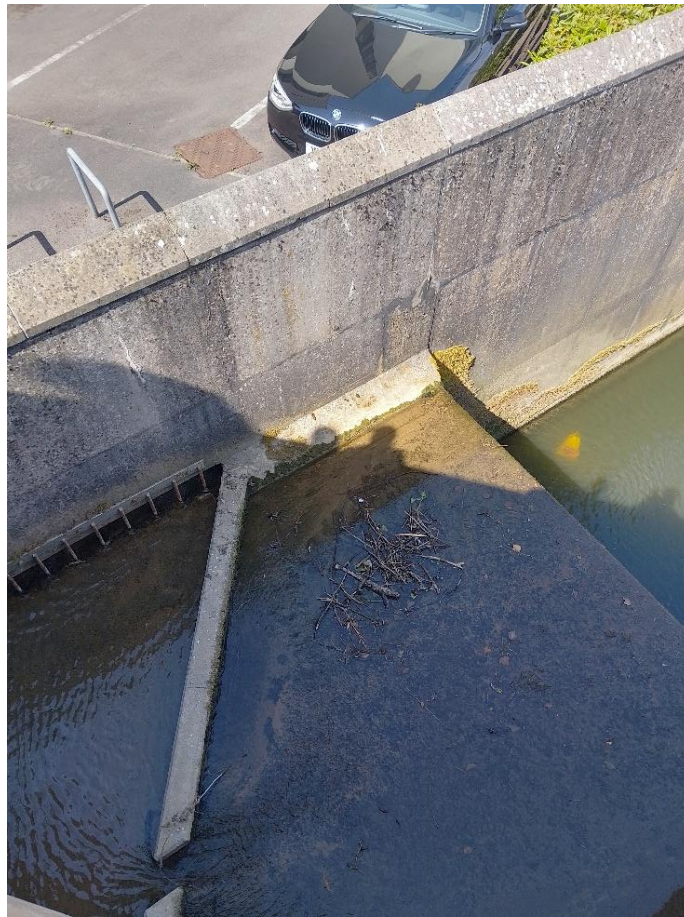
The grill that feeds the small left-hand channel past St James Walk Flats.
